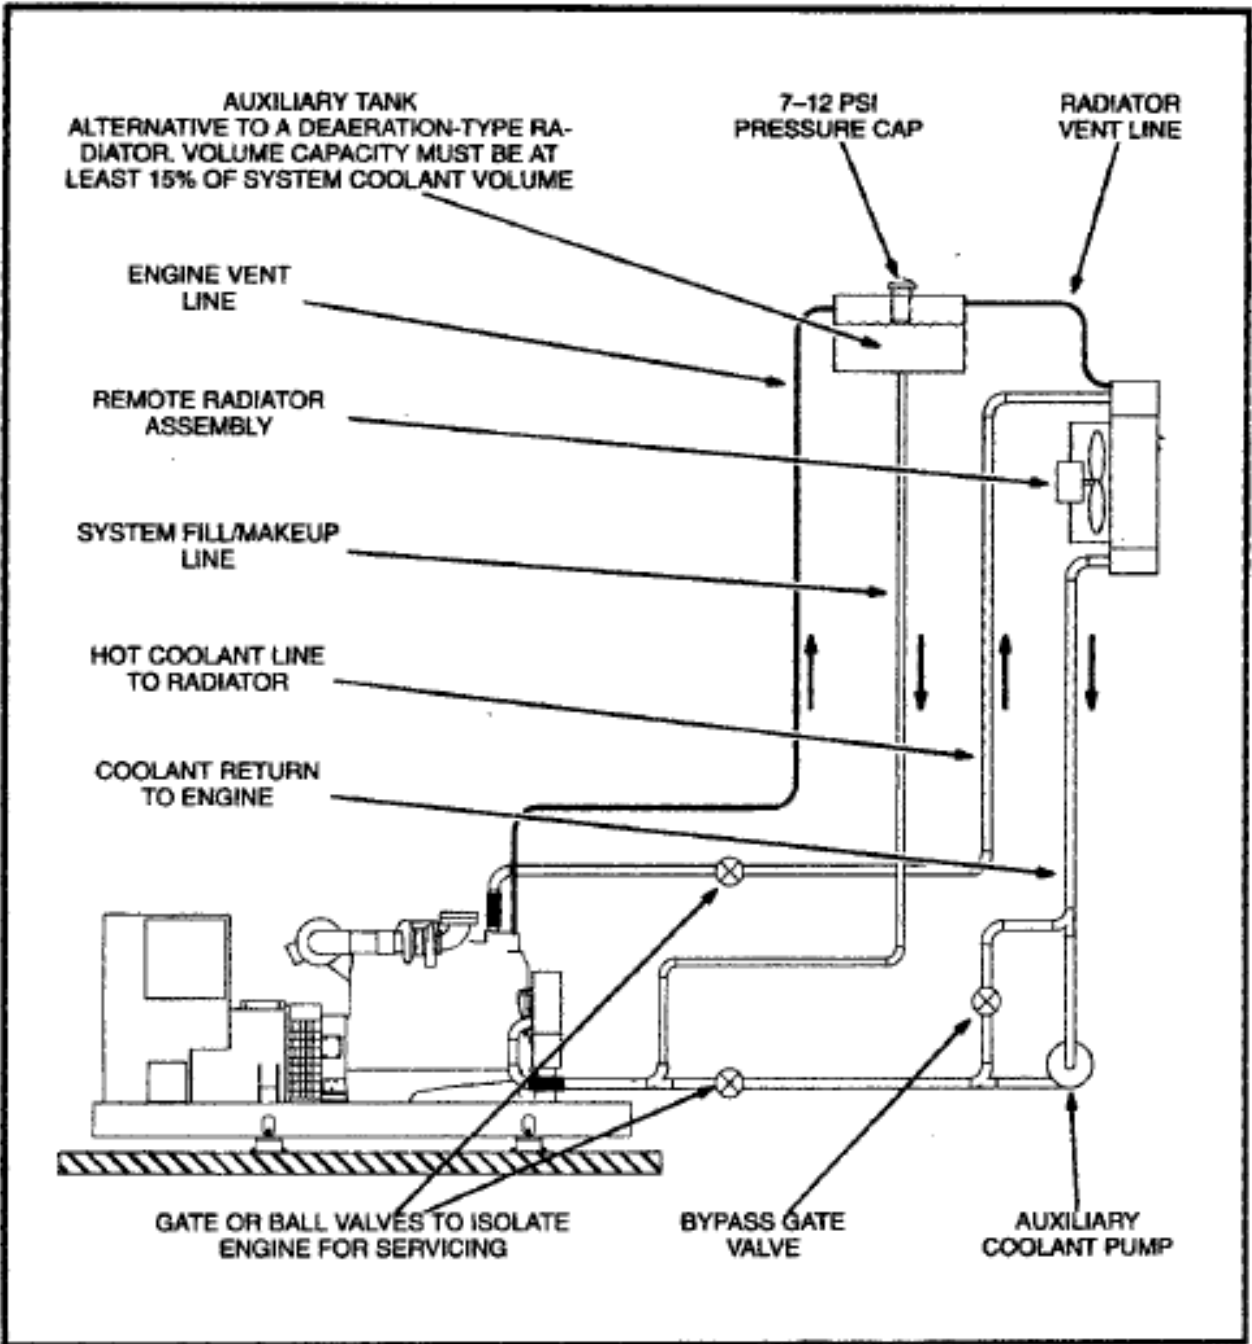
REMOTE RADIATOR WITH AUXILIARY COOLANT PUMP AND AUXILIARY TANK
